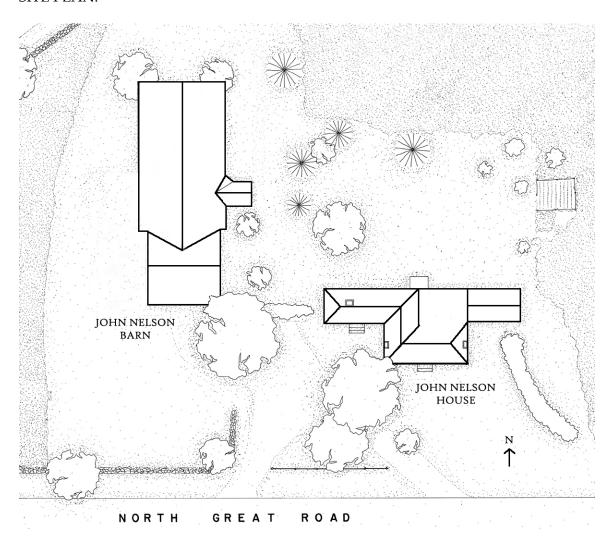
B-4. Site plan (not to scale). Adapted from HABS drawings.
